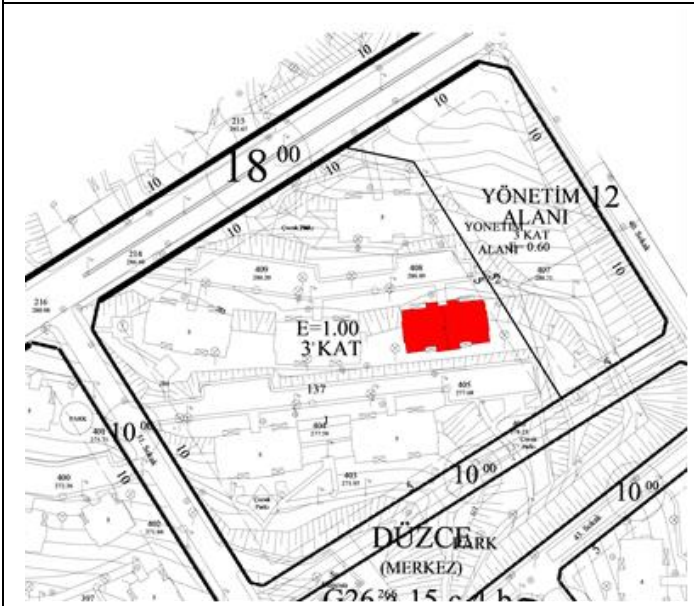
Type-2.1 The building was placed on the 137th island at 280 m elevation in northwest-southeast direction. The residence area is approximately 465 m<sup>2</sup>. It has five floors and consists of 18 apartments in total.
